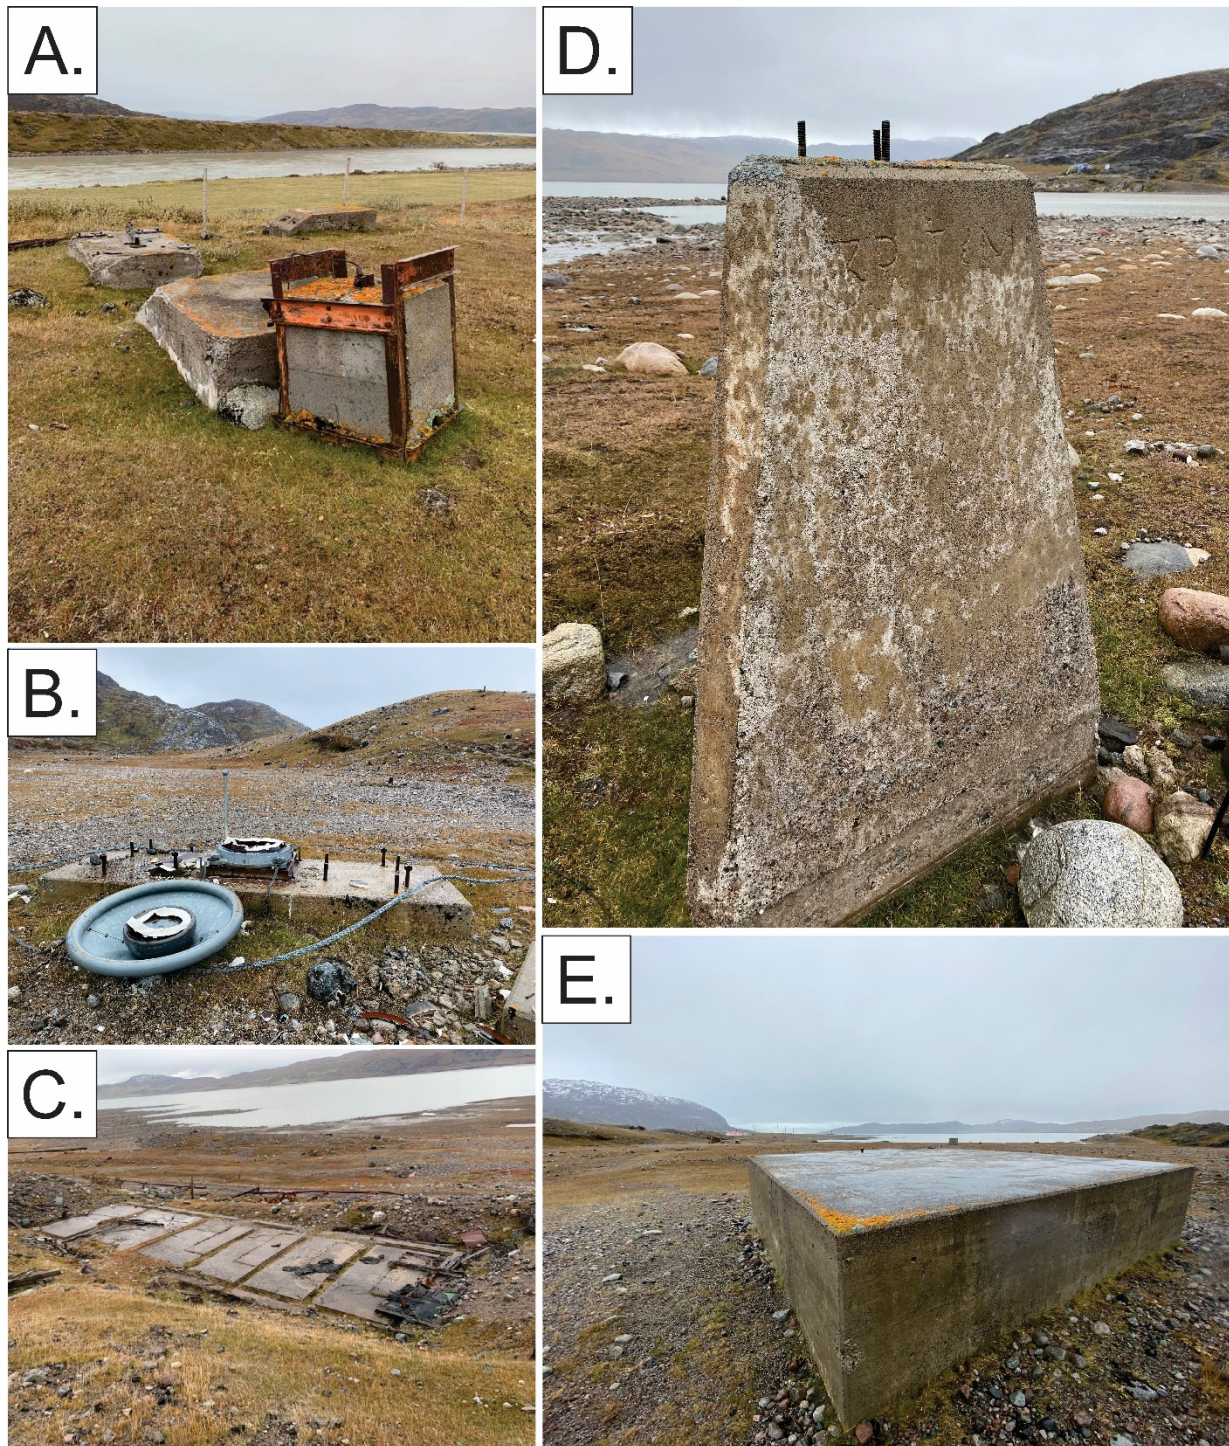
A variety of different types of concrete and cement elements and foundations were identified at Camp Corbett. (A.) F022a, broken cement foundation remains with steel bracing facing south; (B.) F005f, part of the foundation for the steel mast, two ceramic insulators and tension steel cable line was still present at the site, facing northeast; (C.) F009, possibly the footprint of the emergency power generator, facing west; (D.) F002, precast concrete pylon with inscription “3^D I & M,” facing north; (E.) poured concrete platform (F001) that anchored the steel mast antenna, facing south. Photos: Harmsen and Kristensen 2020.
